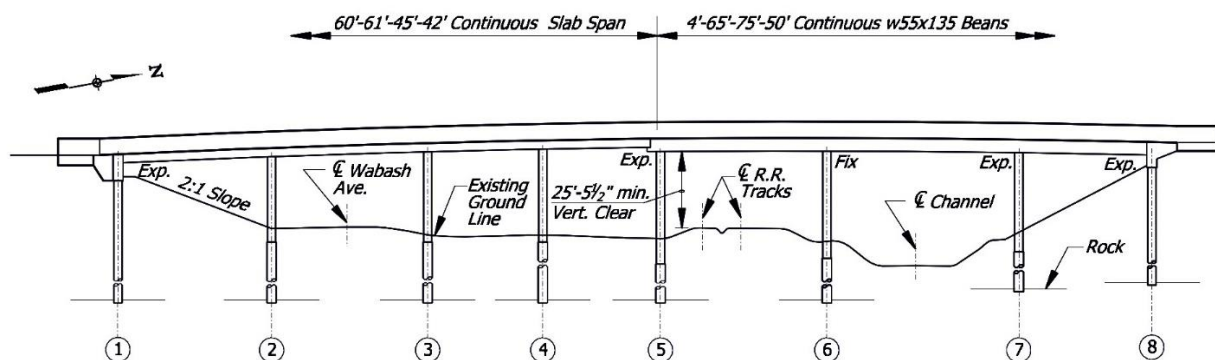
Elevation view for Bridge number 15558X, looking west. (Source: Missouri DOT)
